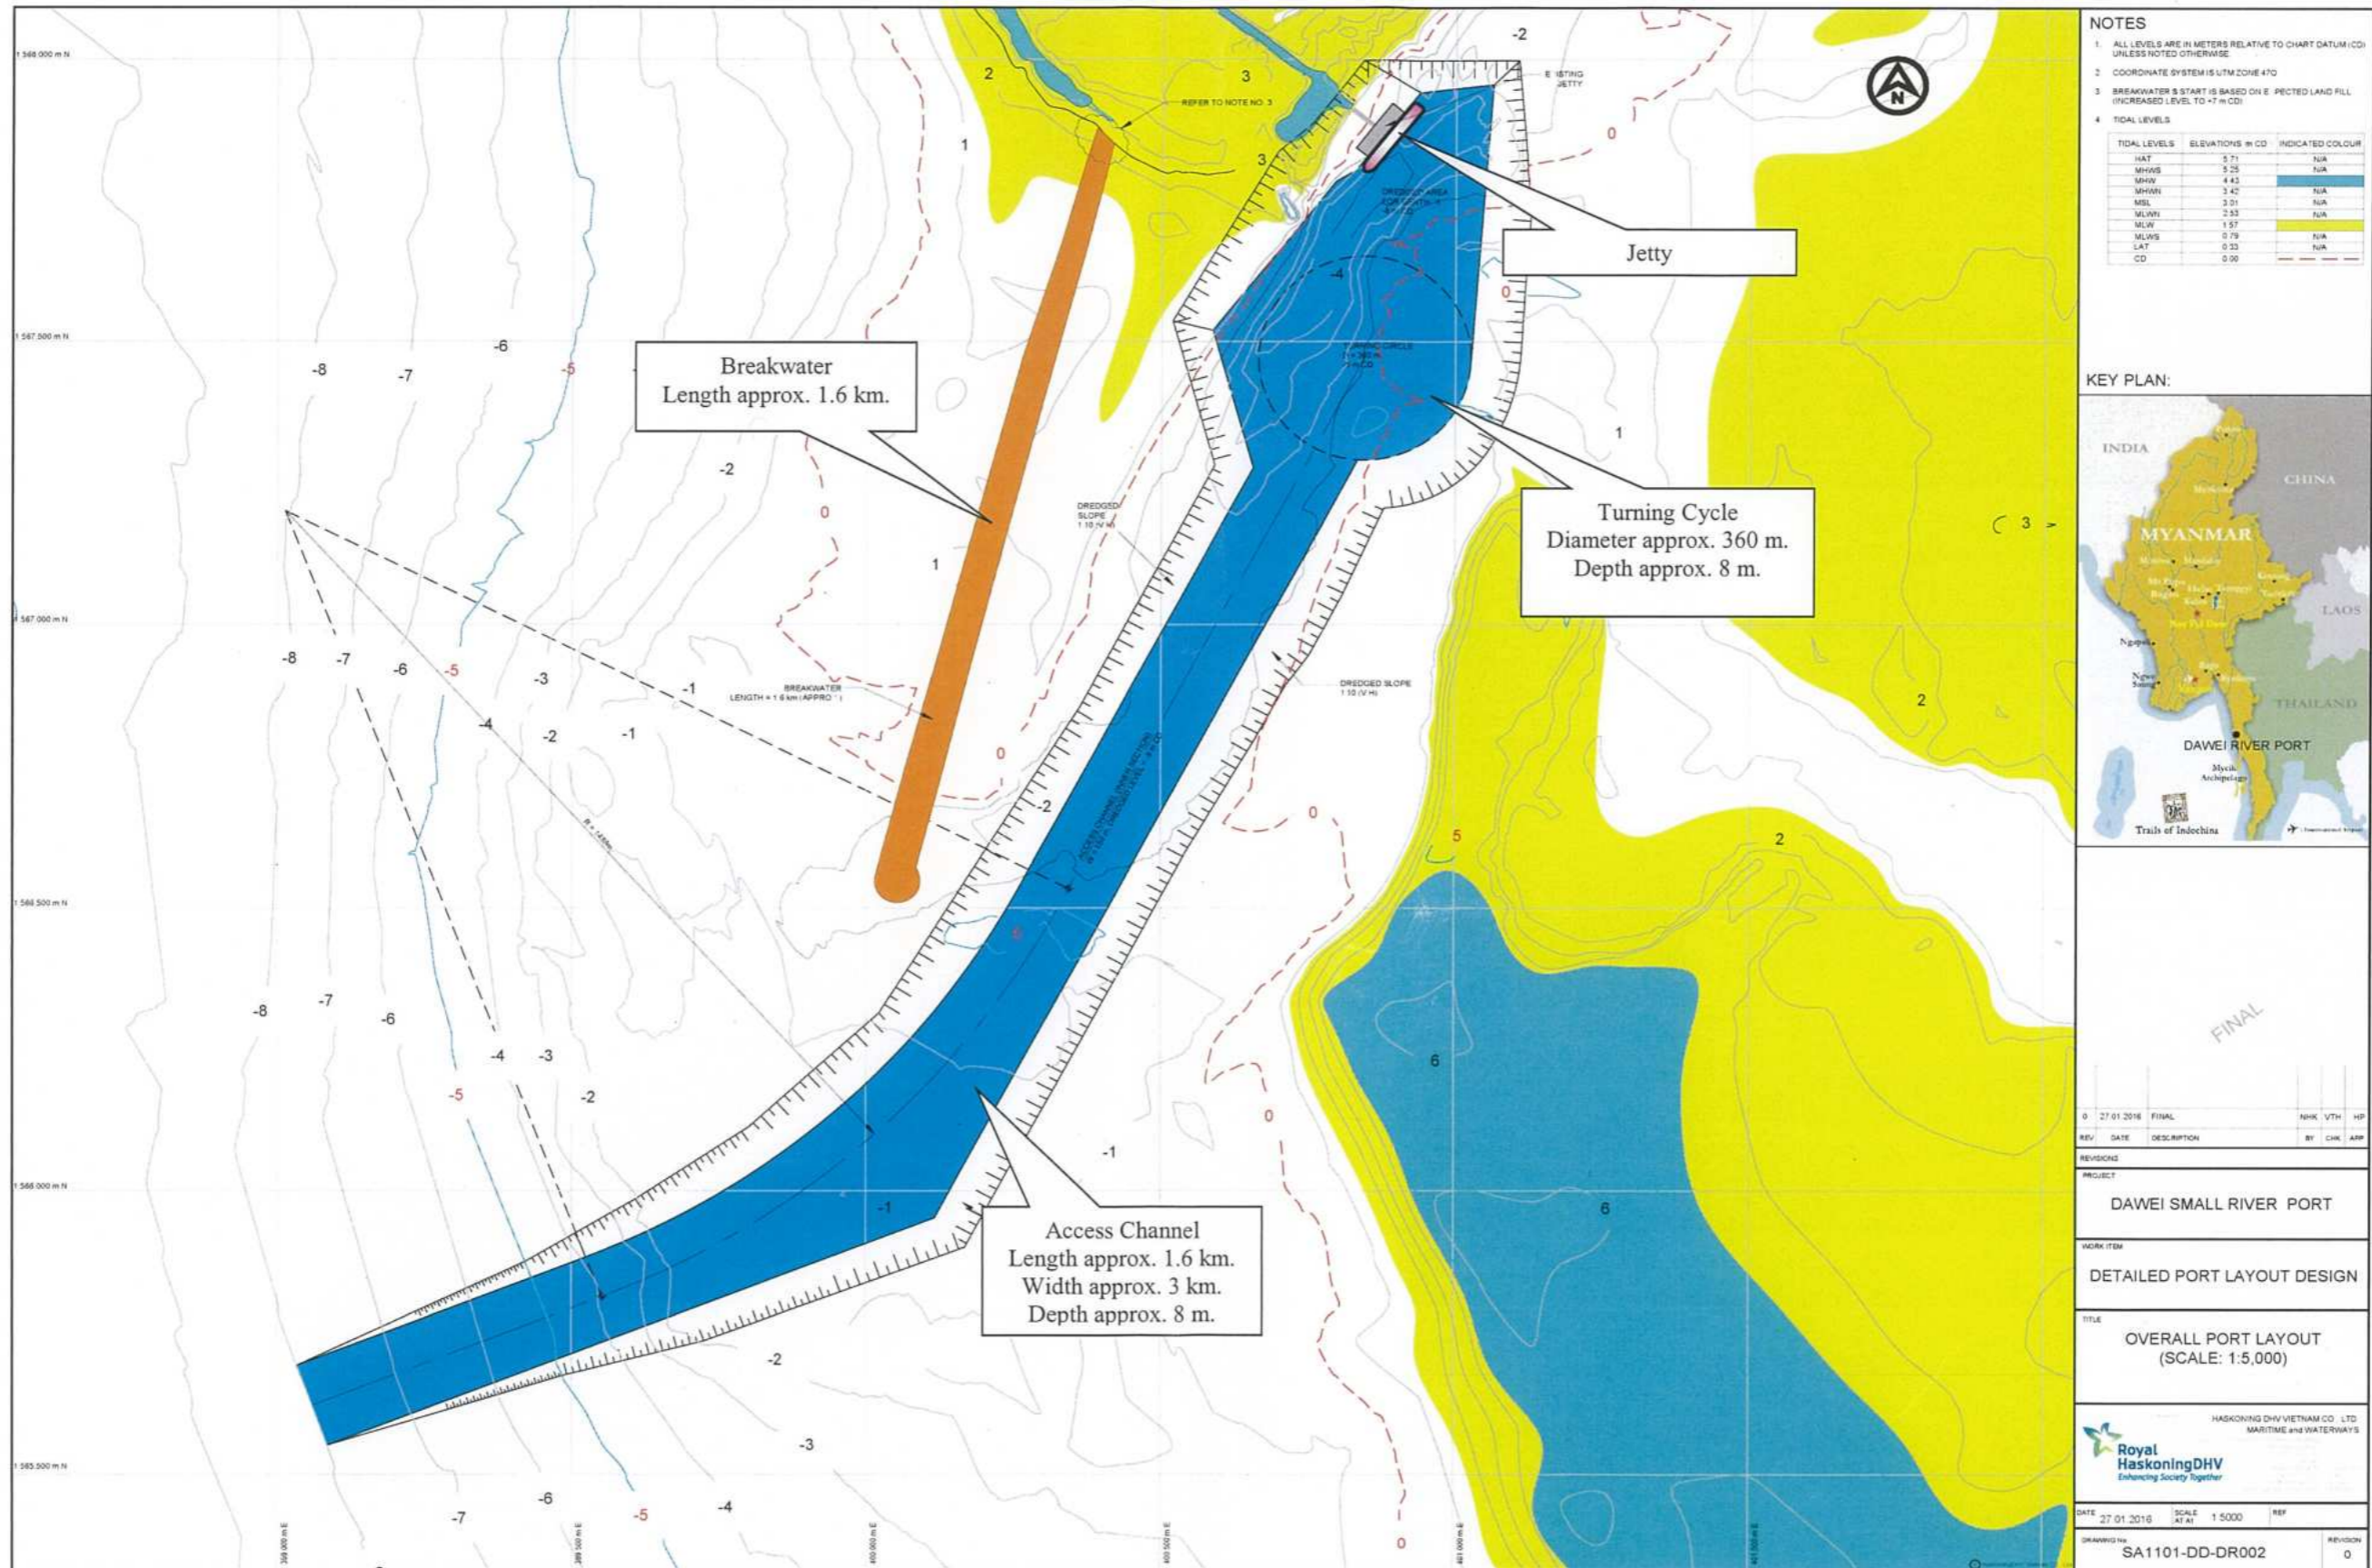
LAYOUT OF OFFSHORE FACILITIES
